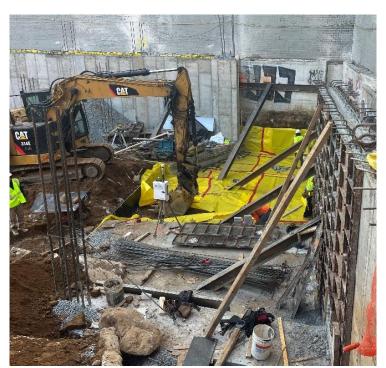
View of contractor preparing for SOE installation in southeastern portion of Site, facing east.
